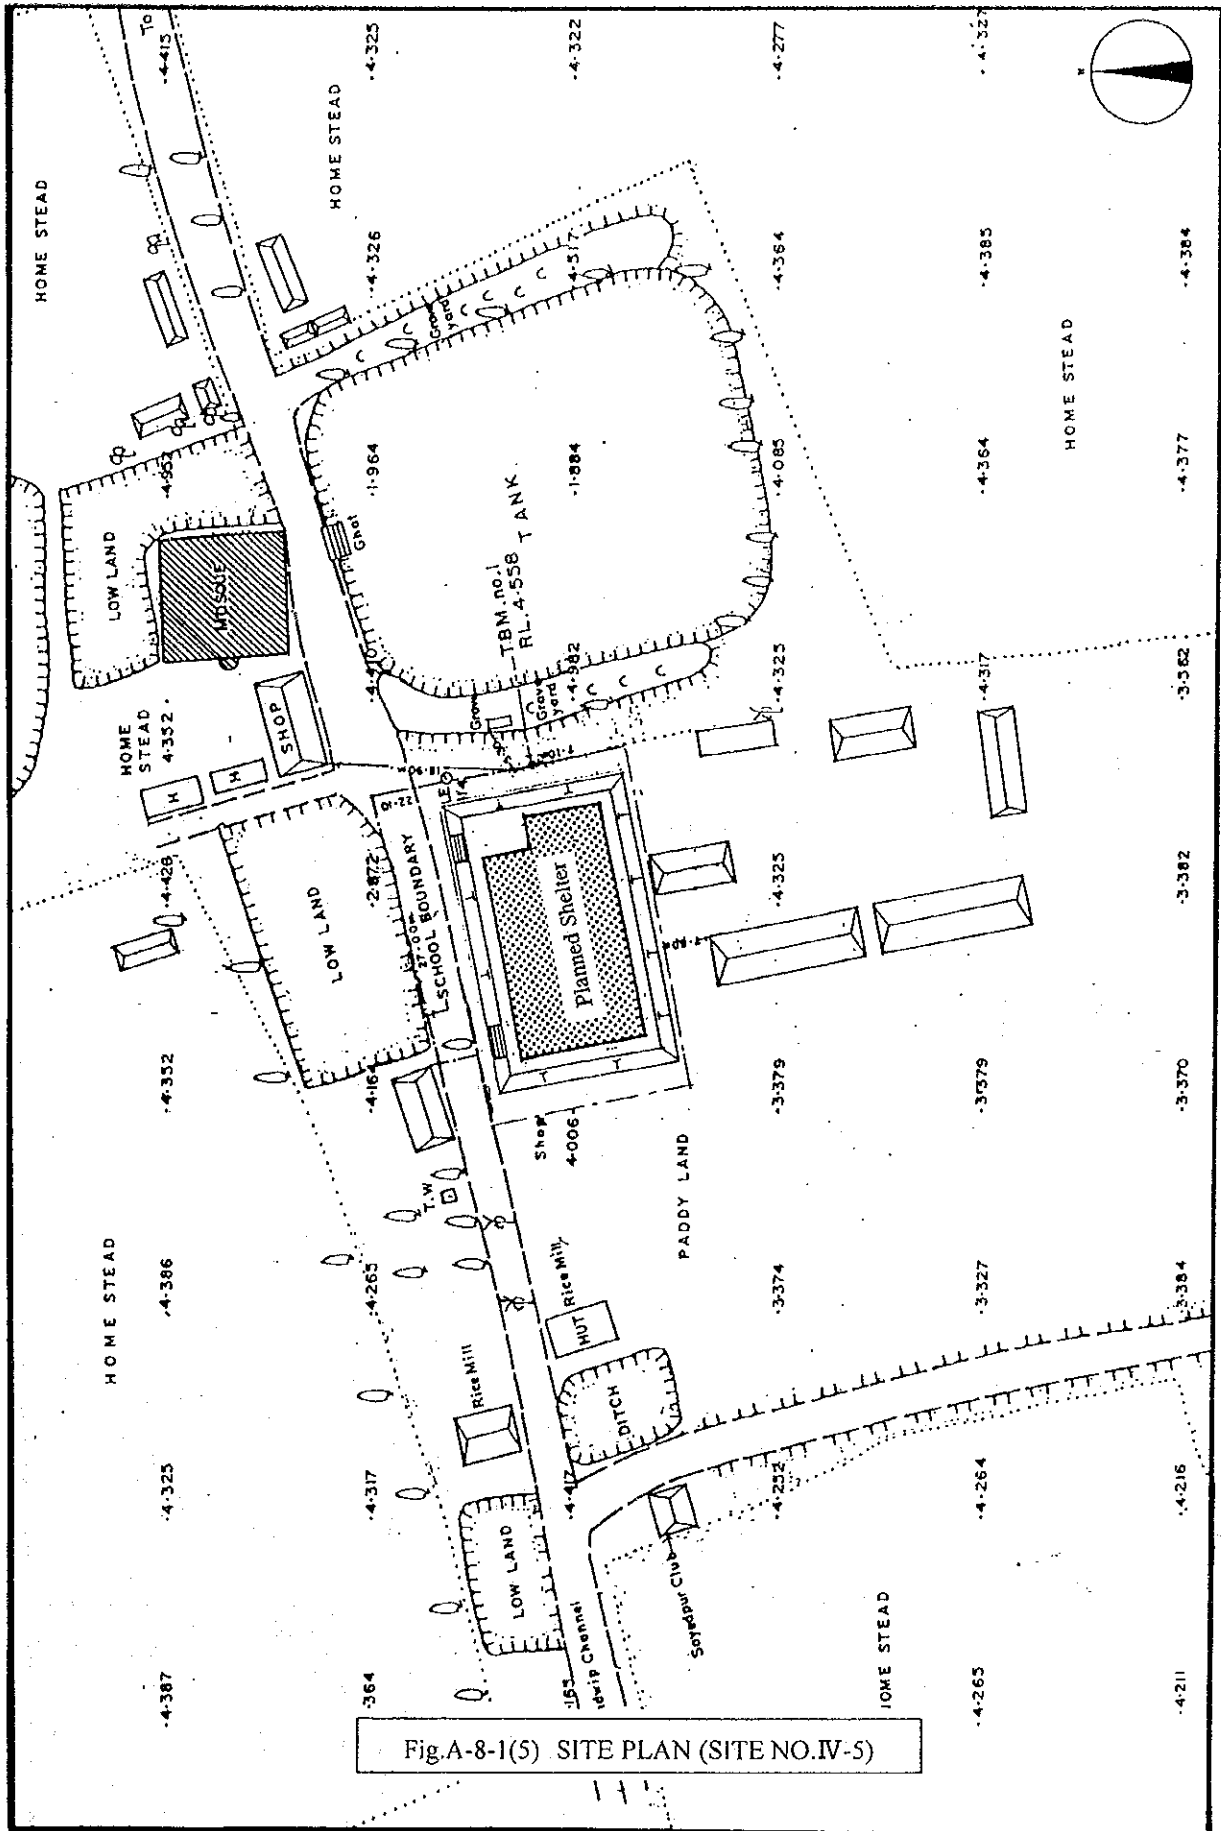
(5) SITE PLAN (SITE NO. IV-5)
